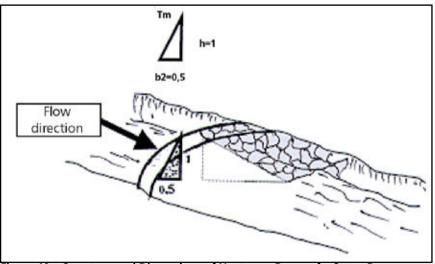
Structure and Dimensions of Upstream Bump of a Stone Dam Source: Padilha (1997).
